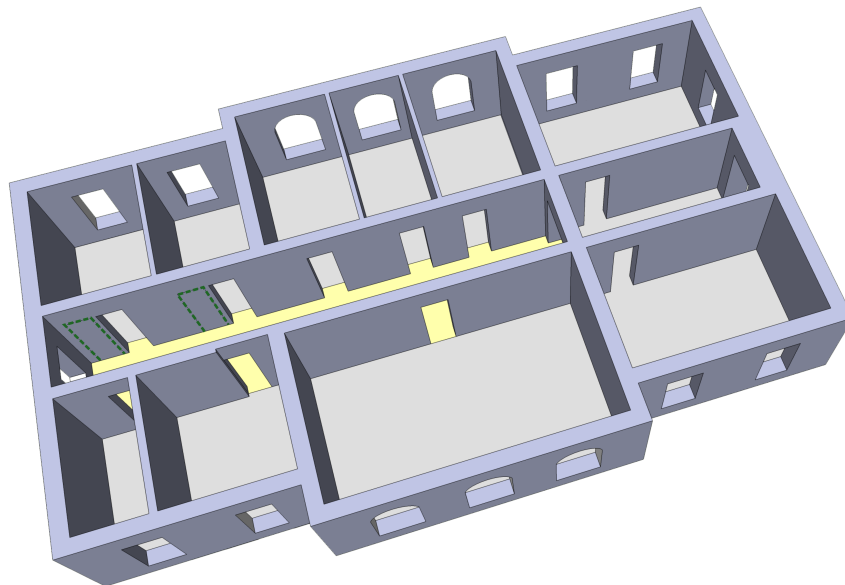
3D indoor model of the resulted floor plan from Figure 5b. Door locations and story heights are derived and classified from background knowledge.
